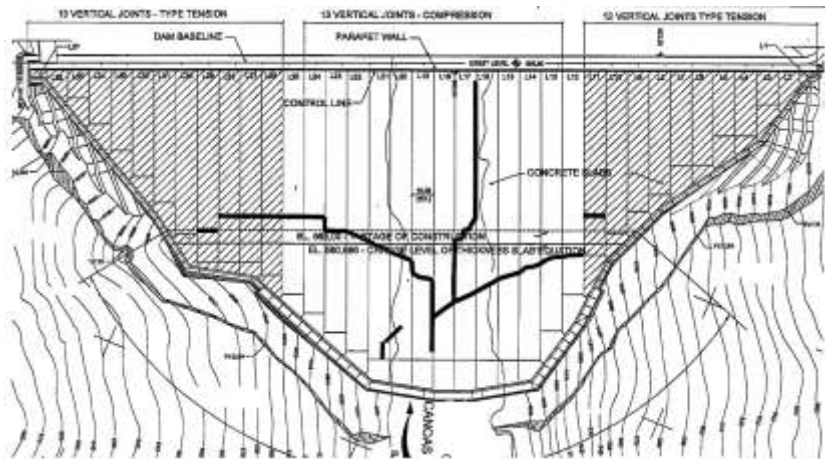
Cracks in Campos Novos concrete facing (IWP&DC, 2008).
